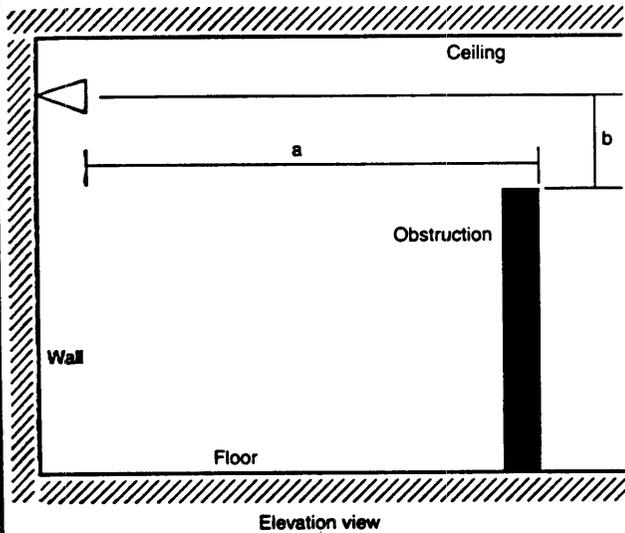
Suspended or floor-mounted obstructions (extended coverage sidewall sprinklers).
